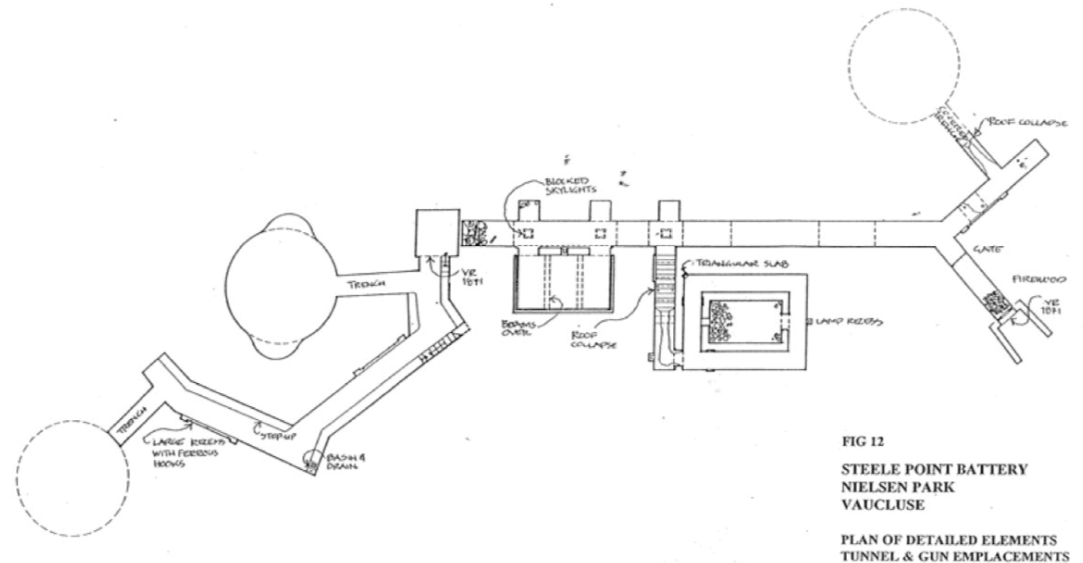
Figure drawn from The NPWS Fortifications of Sydney Harbour and Botany Bay: A Strategic Plan, “Plan of detailed elements, tunnel and gun emplacements”, July 2007, p.111
